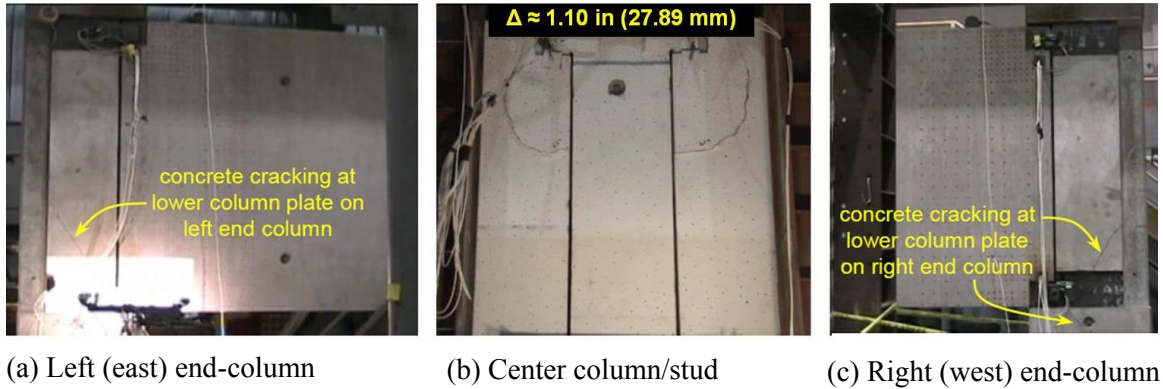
Elevation view, response zone II – incident (b): end-columns first concrete cracks at 114 kips (507 kN)
